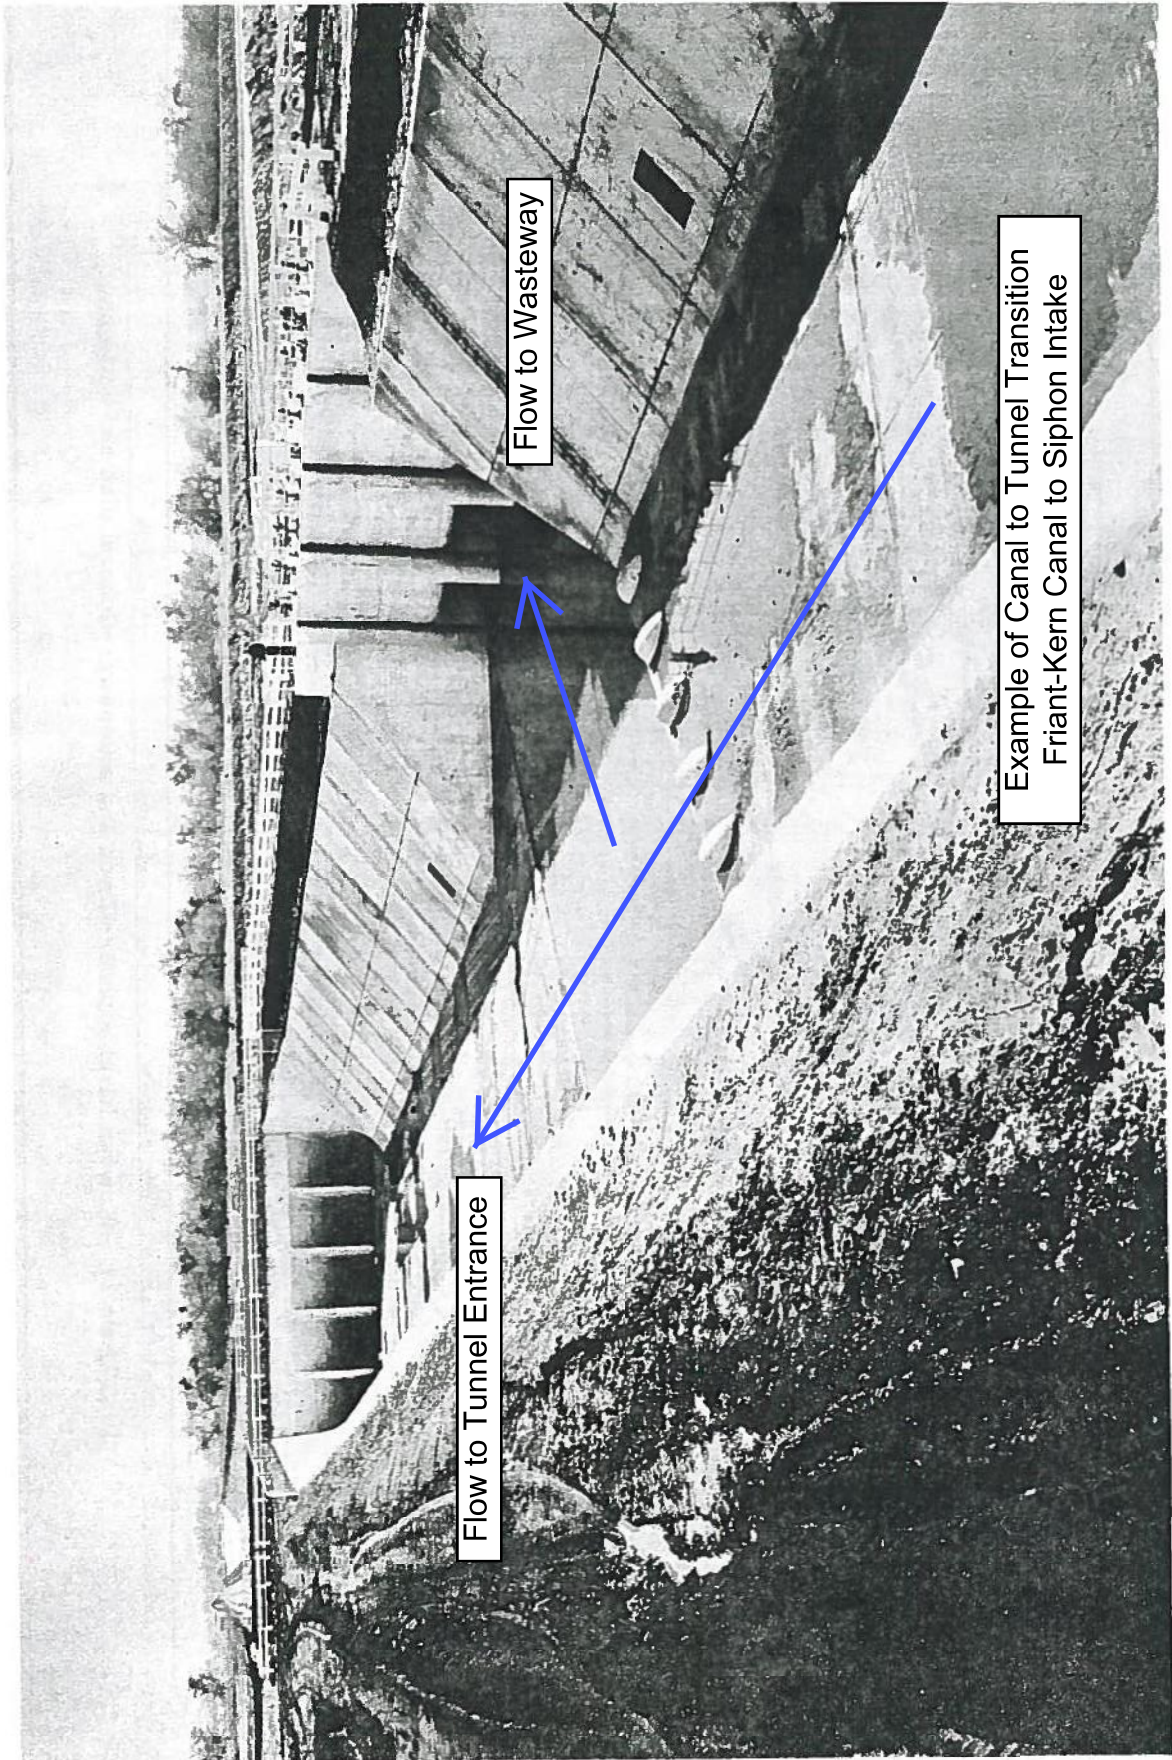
Looking downstream at inlets of completed wasteway and canal siphon structure, St. Johns River, station 3765. FK-2286-CV, February 2, 1950.
